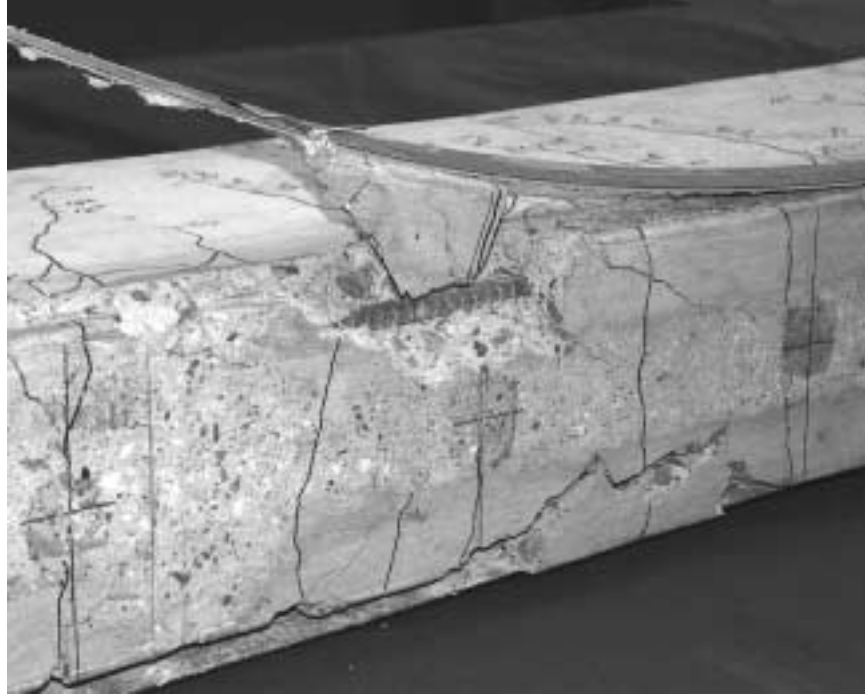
Bottom View of Specimen D3 Showing Exposed Reinforcement after Debonding of CFRP Plates
